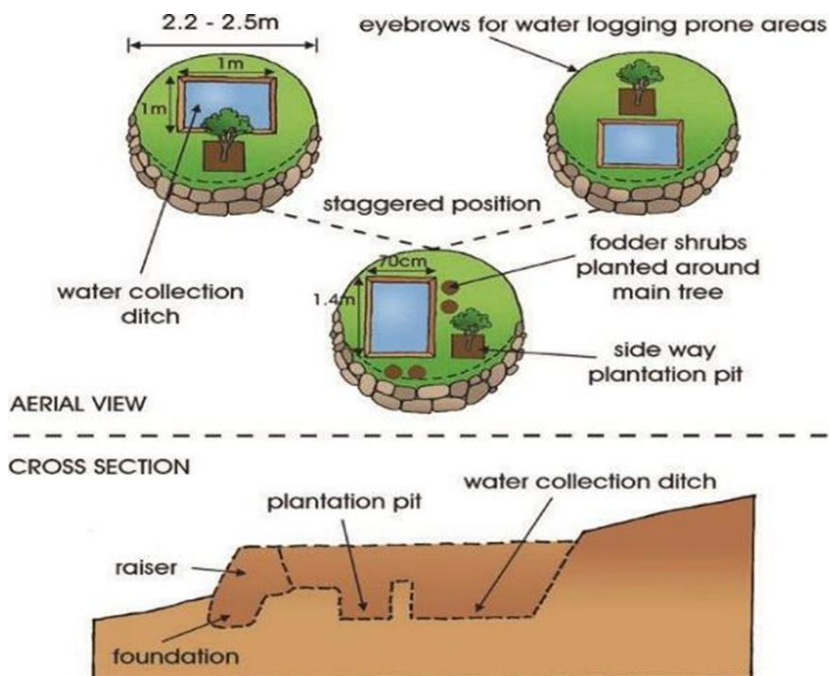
Eyebrow basin layout showing aerial and cross-section views, illustrating the water-collection ditch, plantation pits, staggered arrangement, and integration of fodder shrubs and main trees for moisture conservation in in areas prone to waterlogging.
